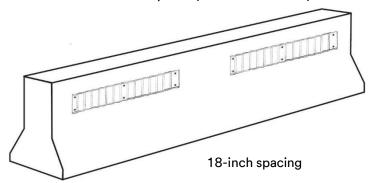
Two linear delineation system panels spaced 18 inches apart on a 10-foot concrete barrier.
